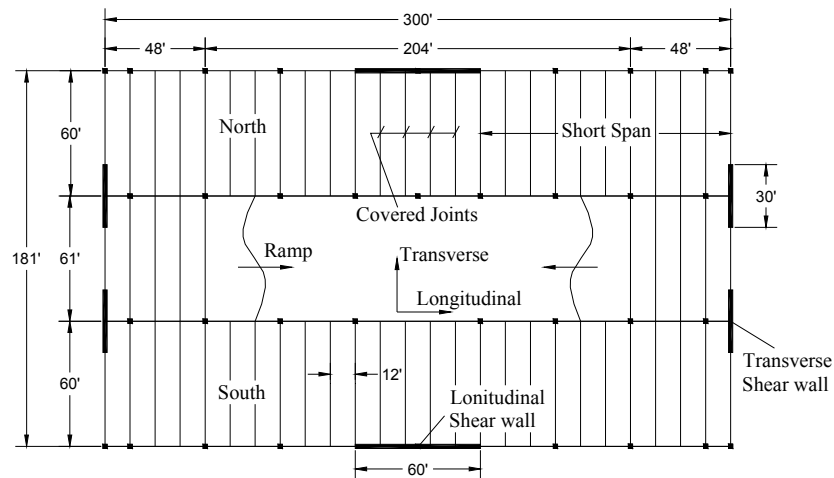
Plan for a 4-story parking garage with perimeter shear walls.
